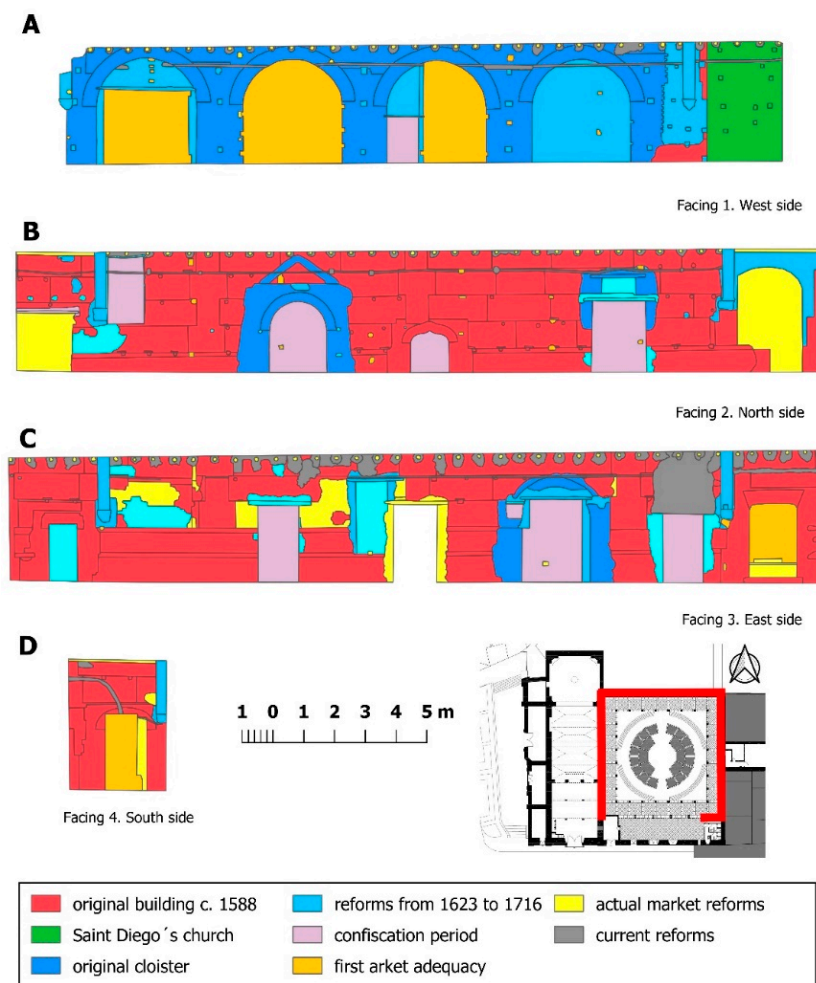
Chrono-stratigraphic phases: (A) west wall, (B) north wall, (C) east wall, (D) south wall.
